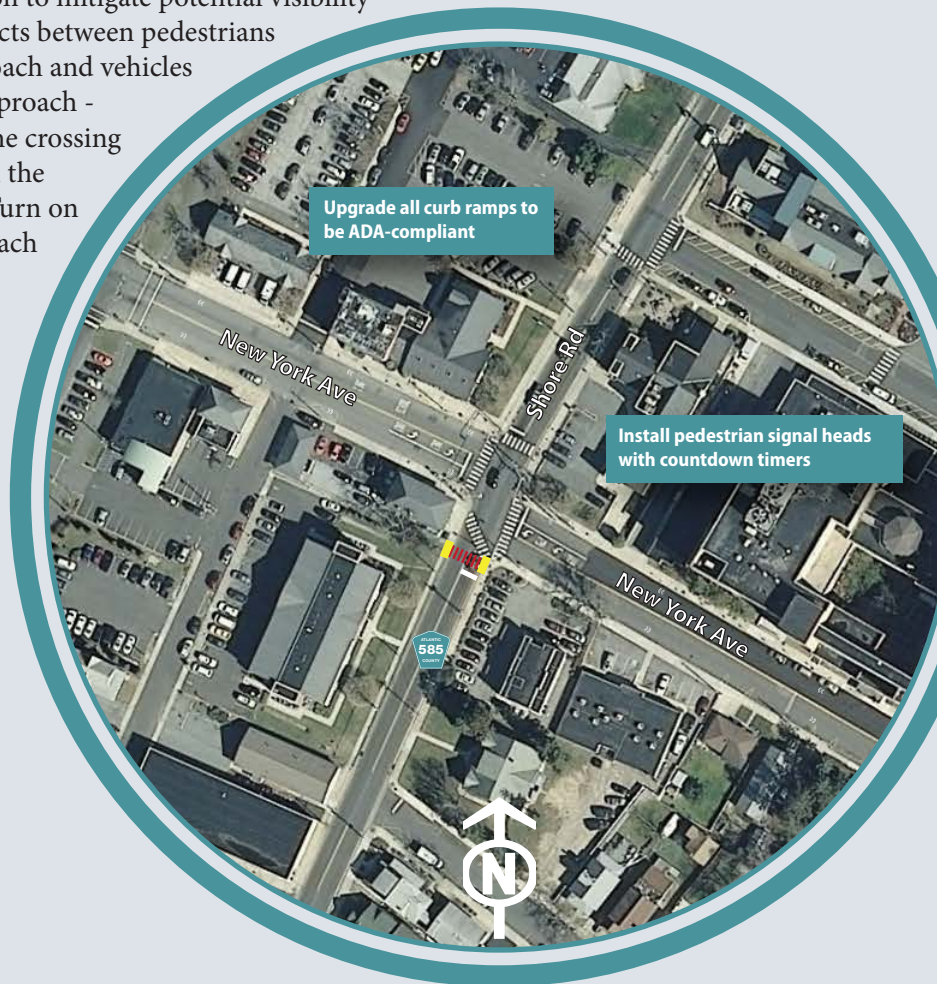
| Shore Road (CR 585) at New York Avenue
